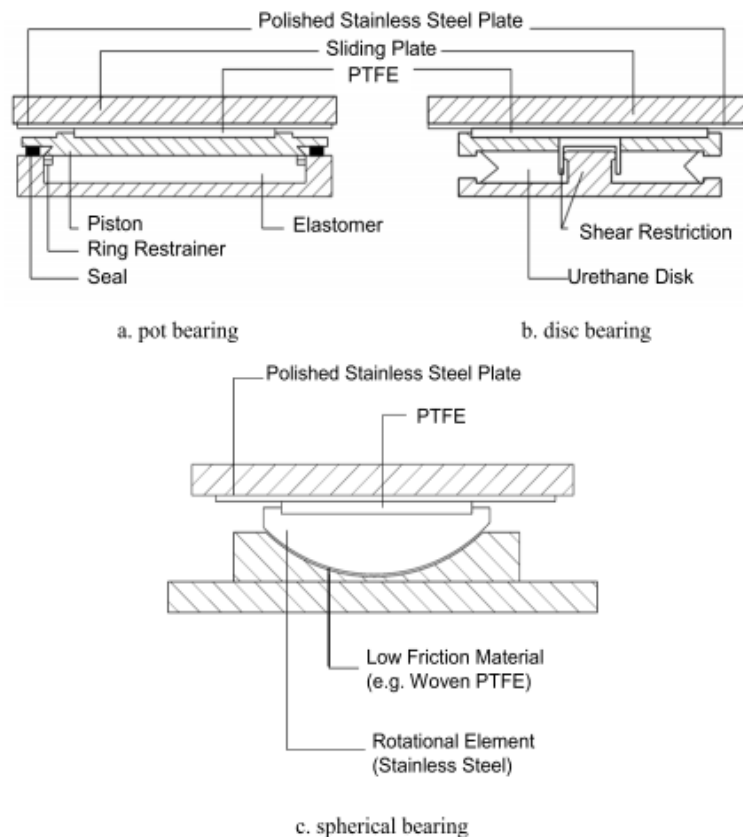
(a) Pot bearing, (b) disc bearing and (c) spherical bearing.
